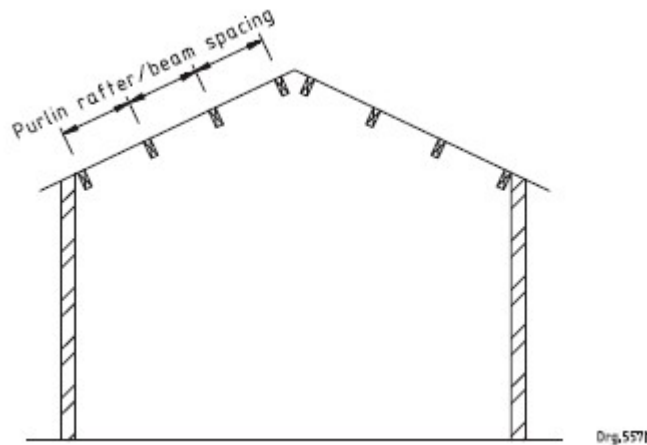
Typical Arrangement of Purlin Rafter/Purlin Beam Construction (See Tables 8 and 9)
